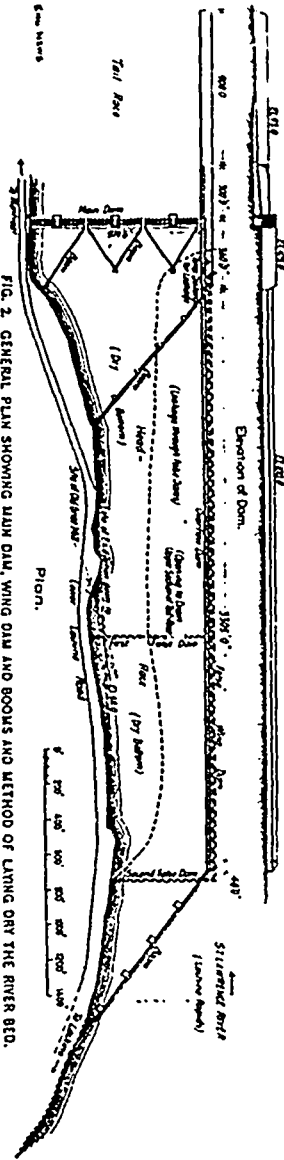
GENERAL PLAN SHOWING MAIN DAM, WING DAM AND BOOMS AND METHOD OF LAMING ON THE RIVER BED.
